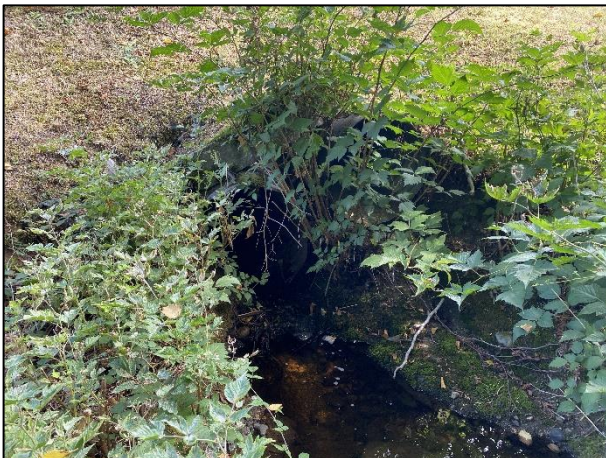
Downstream view of culverts running under the bridge in Area 1.
